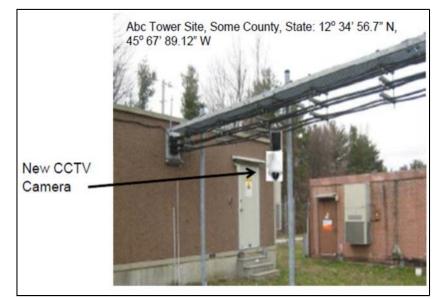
Ground-level photograph with graphic showing proposed equipment installation.
